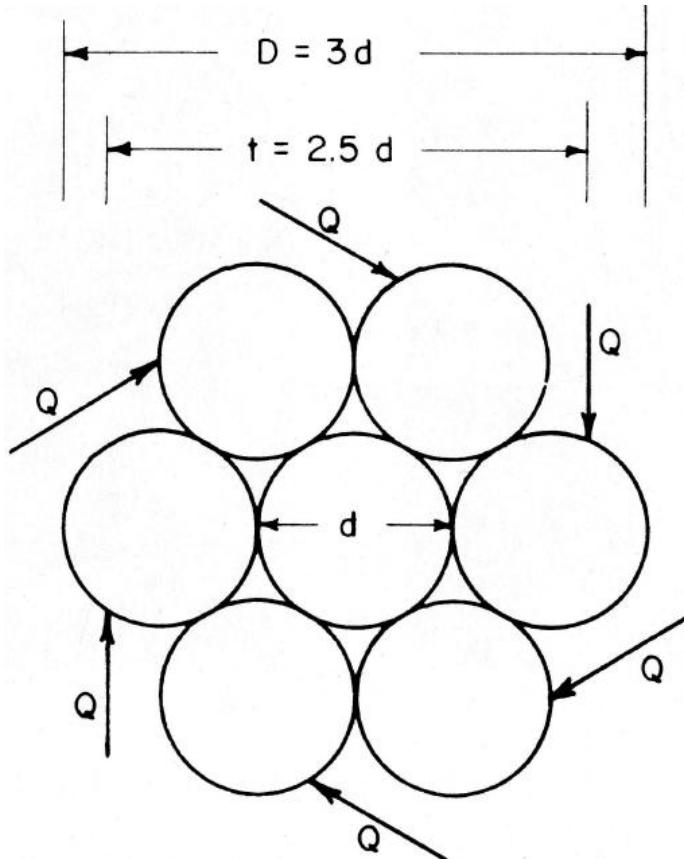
Force interaction between strand and concrete (Stocker and Sozen 1970)
